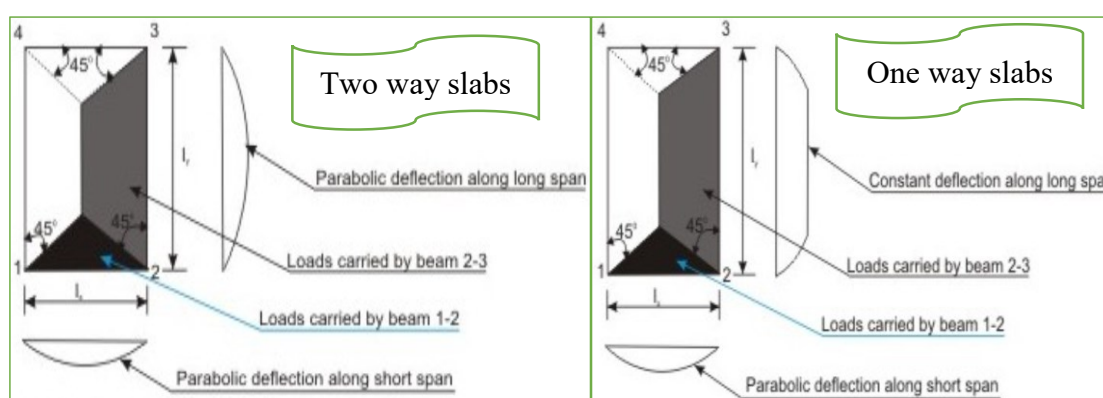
Two-Way and One-Way Slab Load Sharing.
